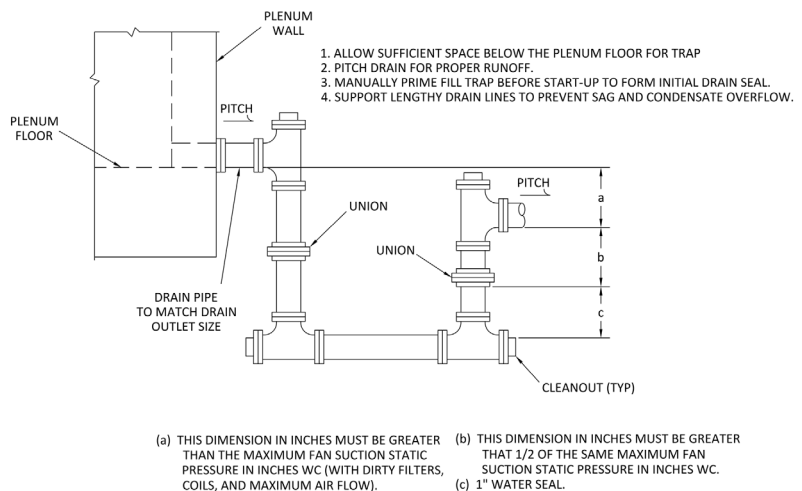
Recommended Duo-Stack P-Trap Drain for Double Wall and HRU Plenums
